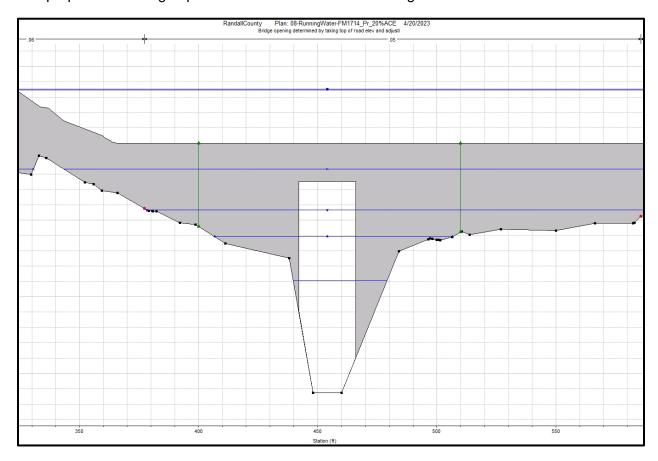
Proposed 20% LOS upstream cross section at Running Water Road and FM 1714 crossing of unnamed tributary to Hackberry Creek.
